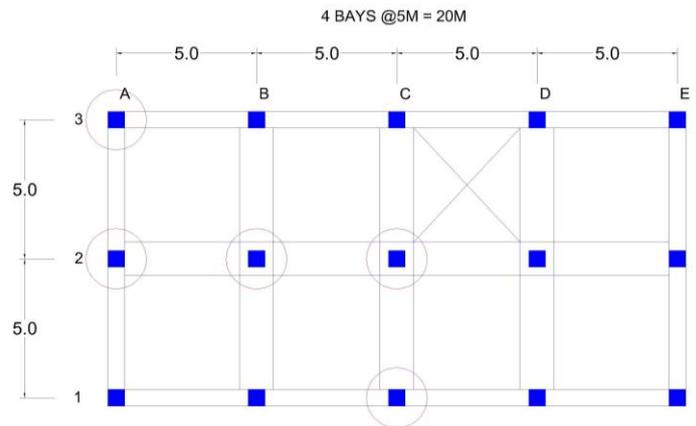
plan view of studied horizontal irregularity flat slab having excessive opening as case no 3.
